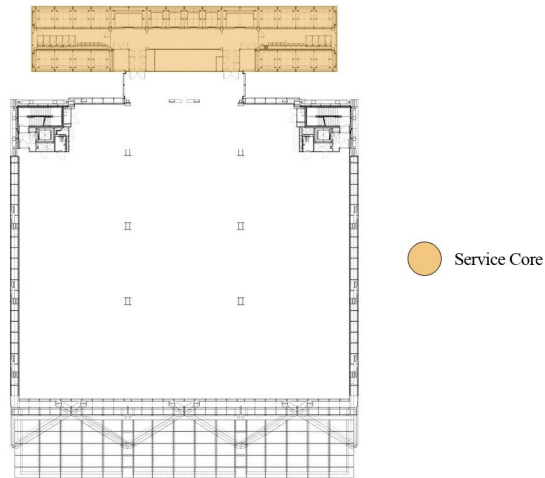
Leadenhall Building, floor plan (Roger & Stirk, 2014)
